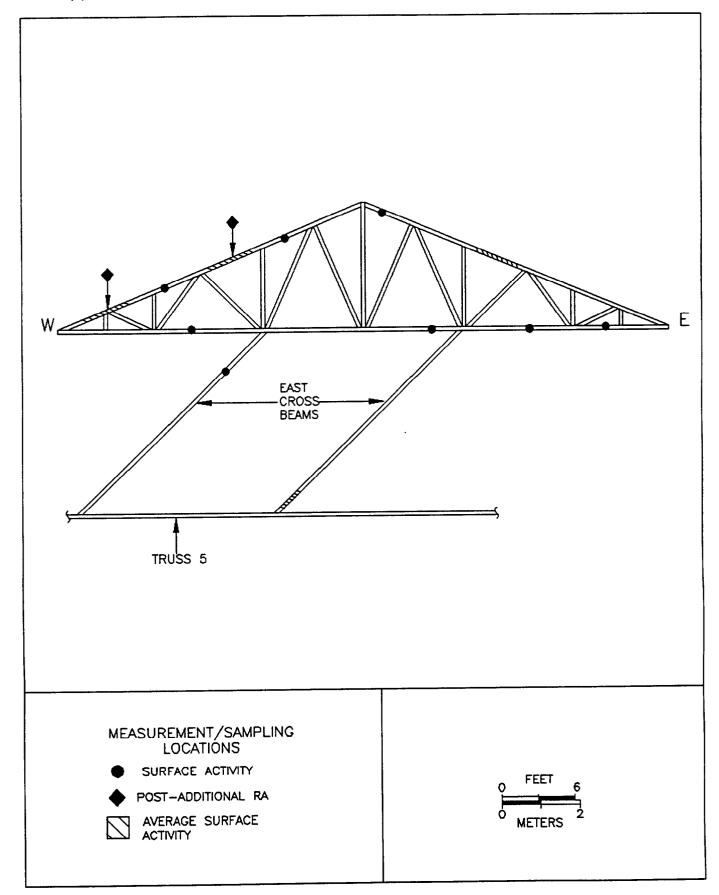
Building 3, Truss 4 - Measurement and Sampling Locations
